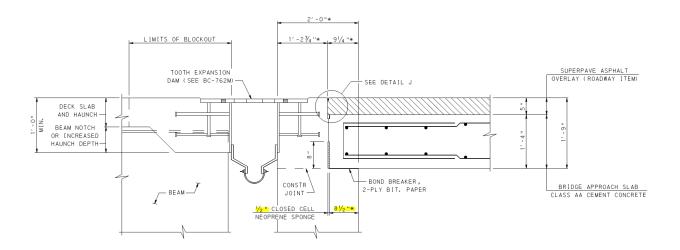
Approach slab with finger plate joint and an exposed drain trough
